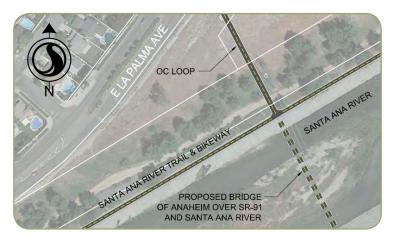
proposed concept for the Santa Ana River Bikeway connection and proposed Anaheim bridge alignment
